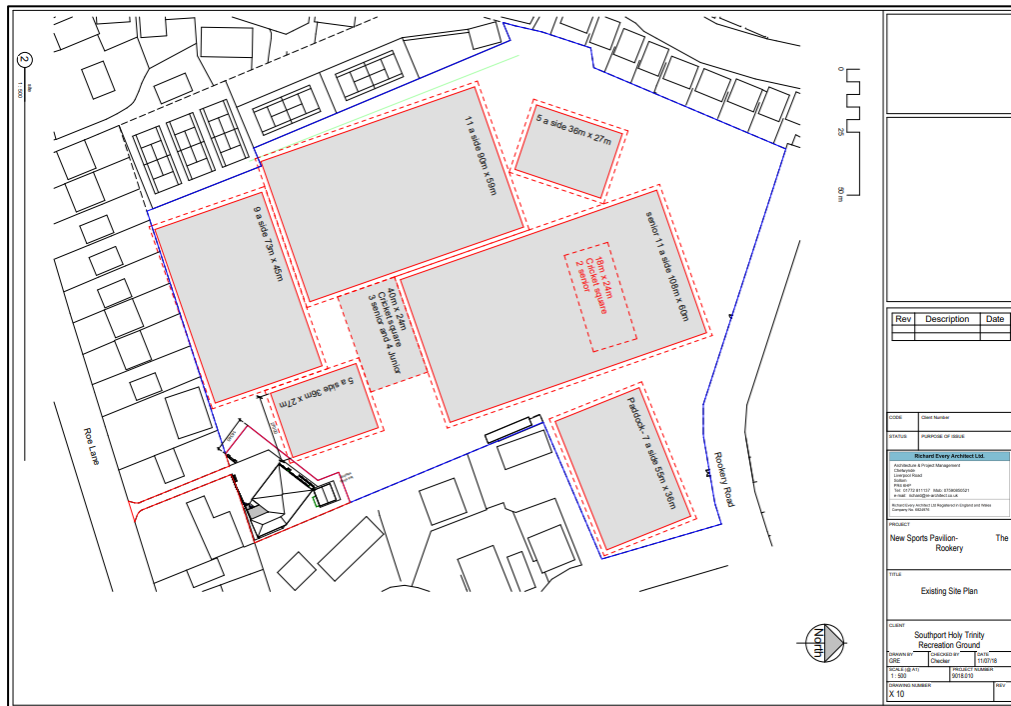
Existing Site Plan (© Richard Every Architect Ltd)
